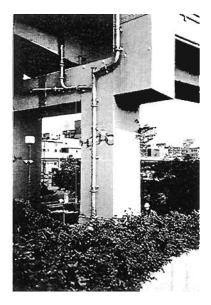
Hanshin Expressway Route 2 near the centre of Kobe- Damage to Rectangular Steel Pier Column change in wall thickness is likely to explain location of buckle in this stiffened box column
